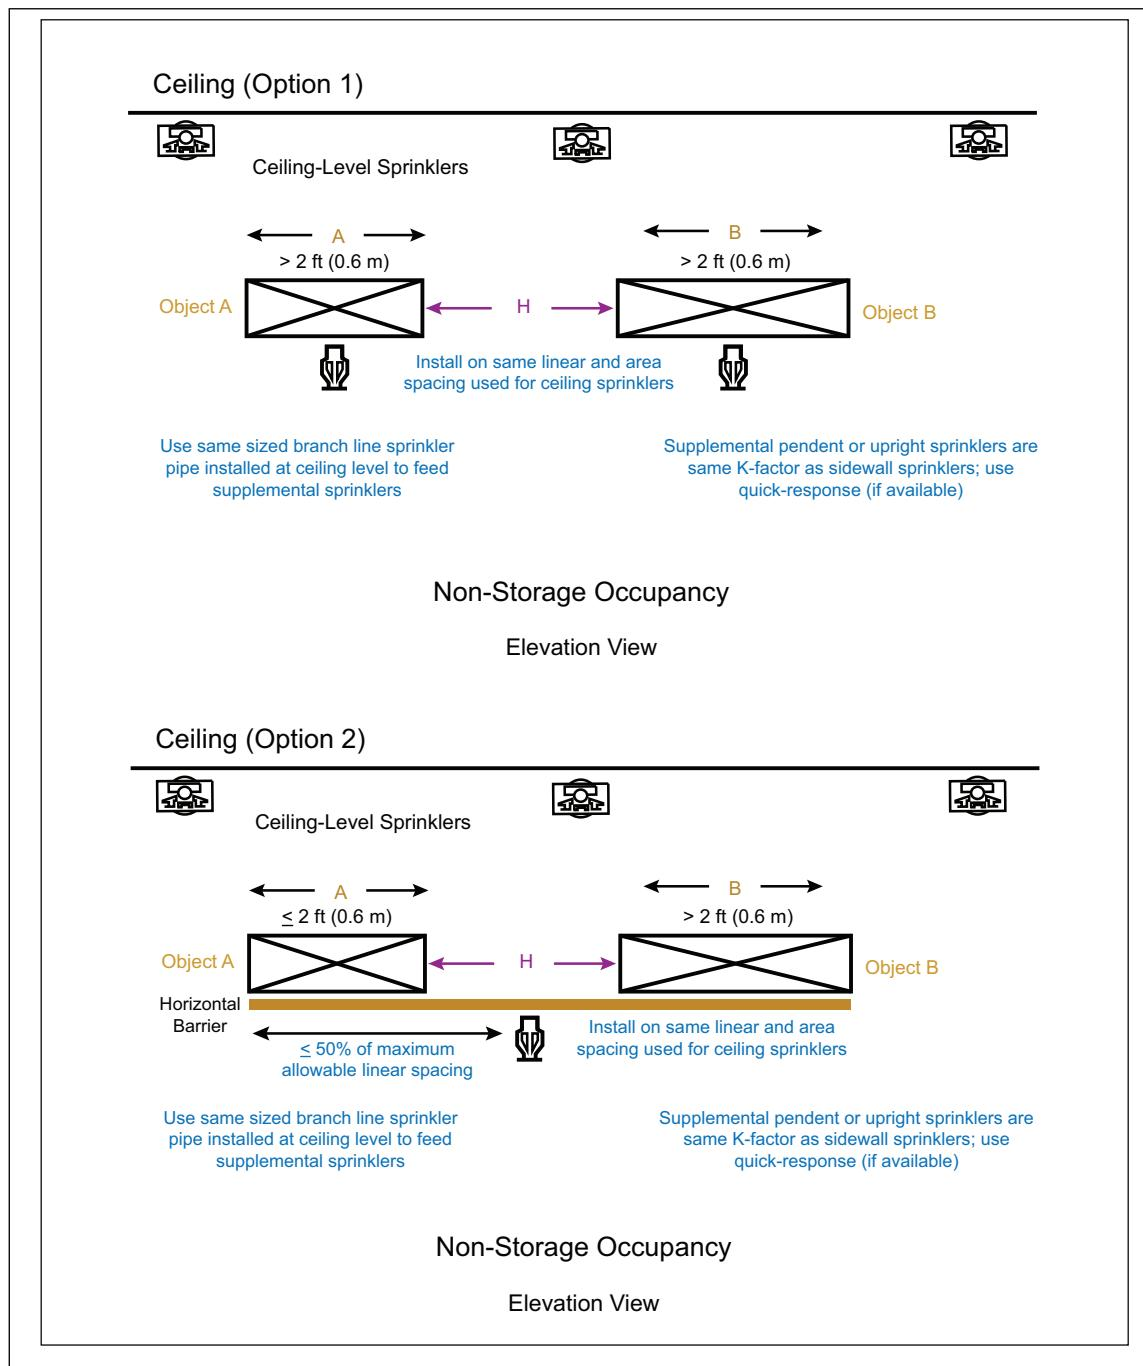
Supplemental sprinklers installed below flat, solid, grouped obstructions over 4 ft (1.2 m) wide
